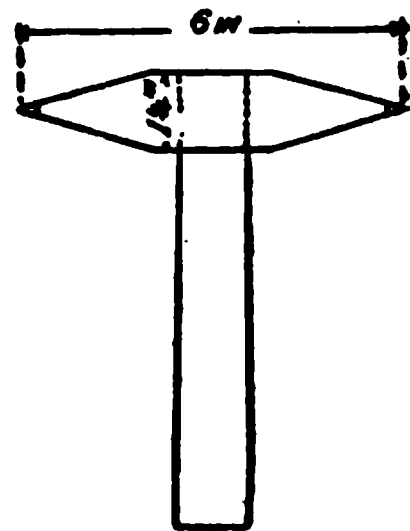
Pick for Facing Concrete. (See p. 381.)
